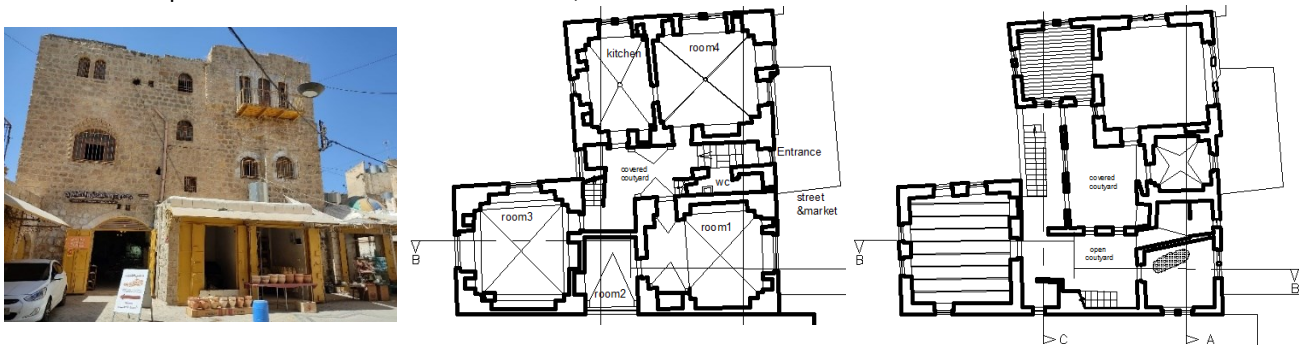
(Left) Front facade of the building, (Middle) First floor,(Right) Second floor.
